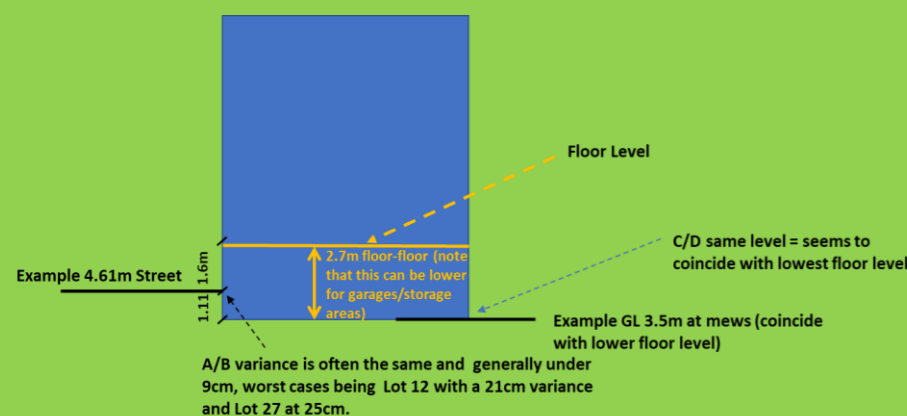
Illustrates an example where habitable rooms at mews level are provided resulting in a wall at the street of 1.6m height which would require the ground floor to be lowered 100mm below the mews level to meet the 1.5m maximum wall height to a Road or Park.
